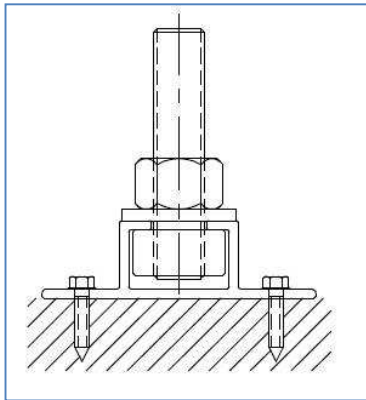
Schematic of rail mounting to roof, for illustration purposes only. Also shown is connection between rail and threaded rod.
